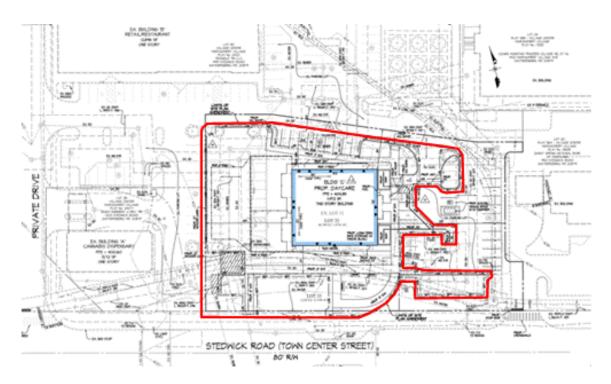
Proposed Limits of the Site Plan Amendment (highlighted in red)
